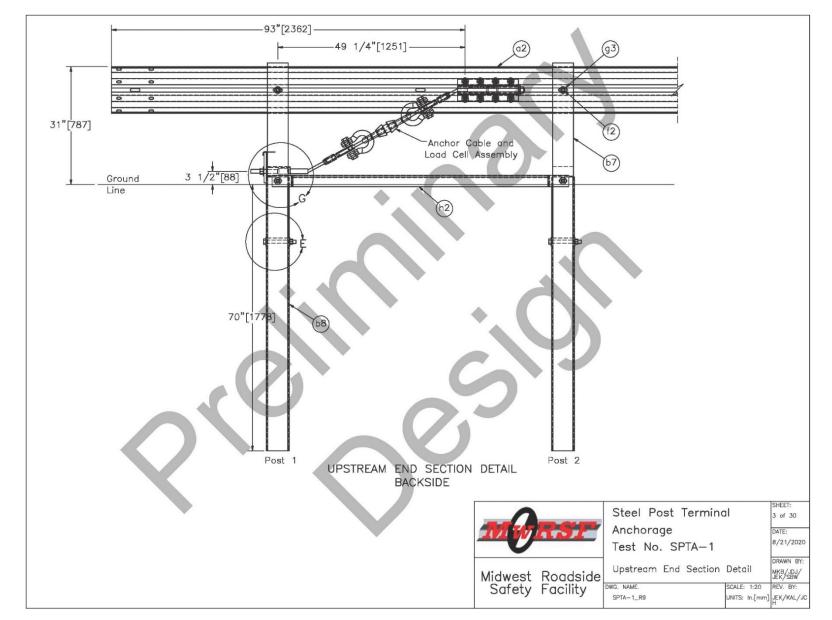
Upstream End Section Detail, Test No. SPTA-1
